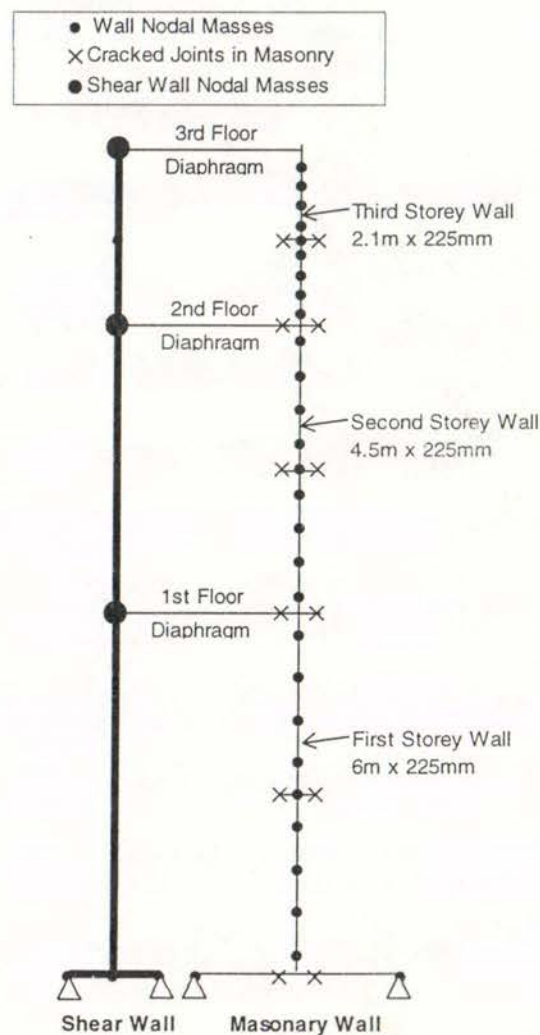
Diagram of 3-storey Inelastic Computer Model for Face-loaded Masonry wall
